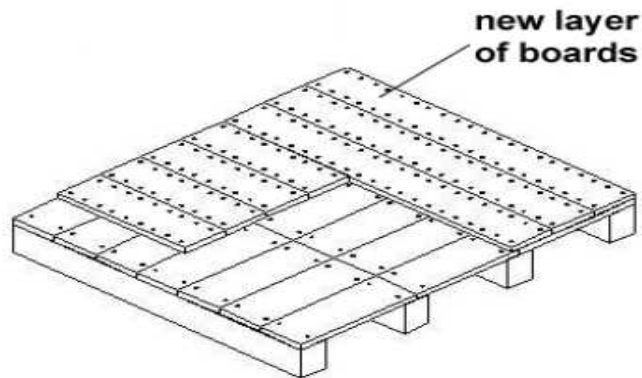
Timber Panel Overlay above the Existing Timber Floor
